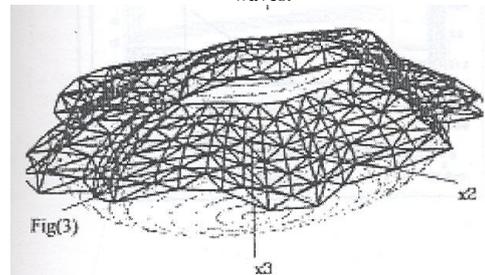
Scheme of double layer, wavy space bar structure – horizontal and vertical waves.
